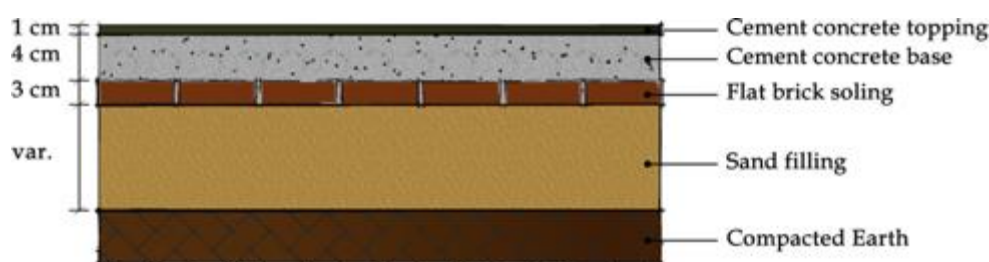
Recommended detailing for a brick and cement raised foundation.
